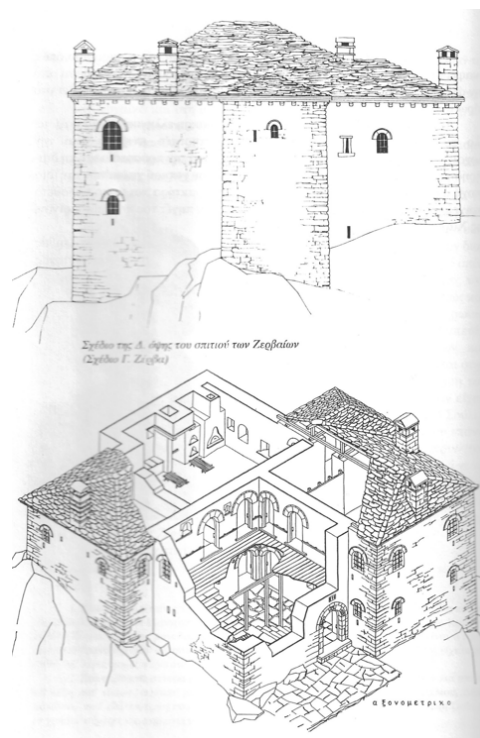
West front view and axonometric plan of the Zervas' house [18]
